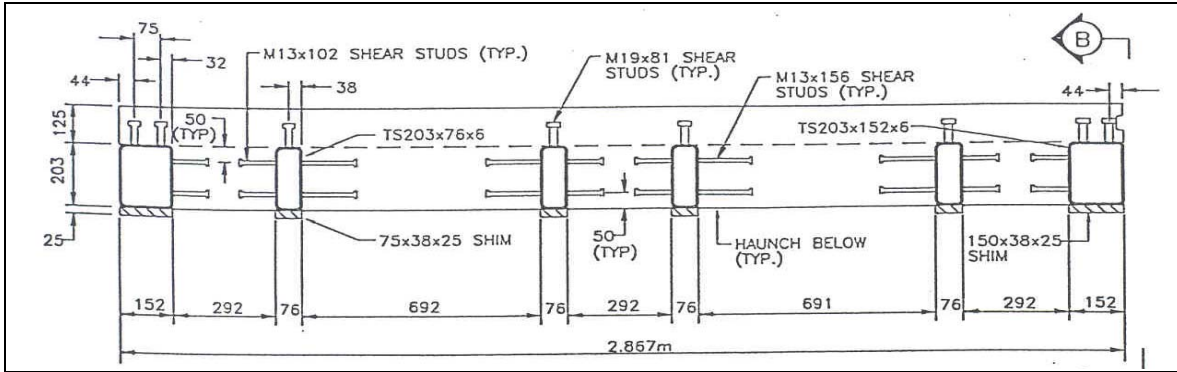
Typical panel cross section at full-depth portions showing studs for bridge over Cascadilla Creek, Ithaca, NY (The Fort Miller Co., Inc., 2001)
